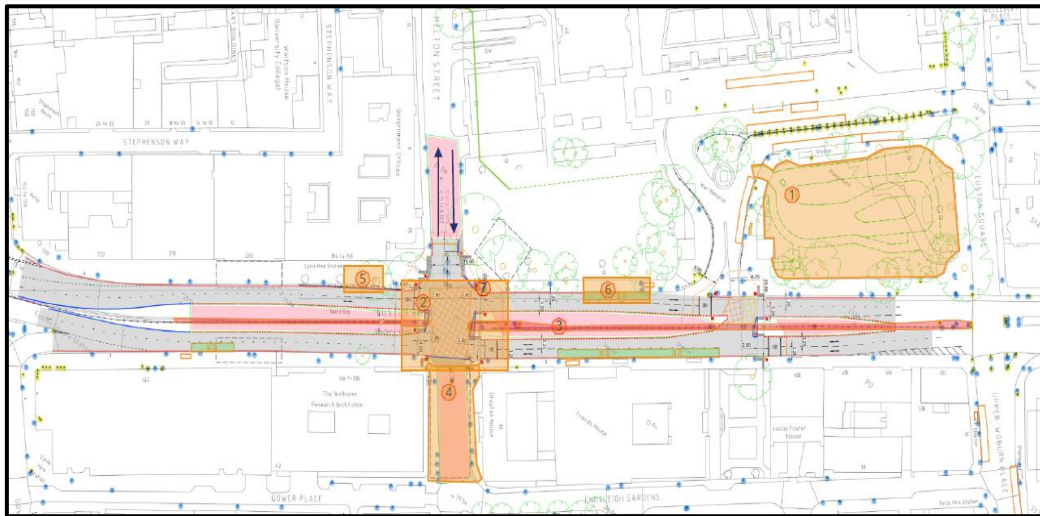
Euston Road Central Section works (primarily consisting of Junction signal modification by TfL and removal of central reserve by MDJV)
